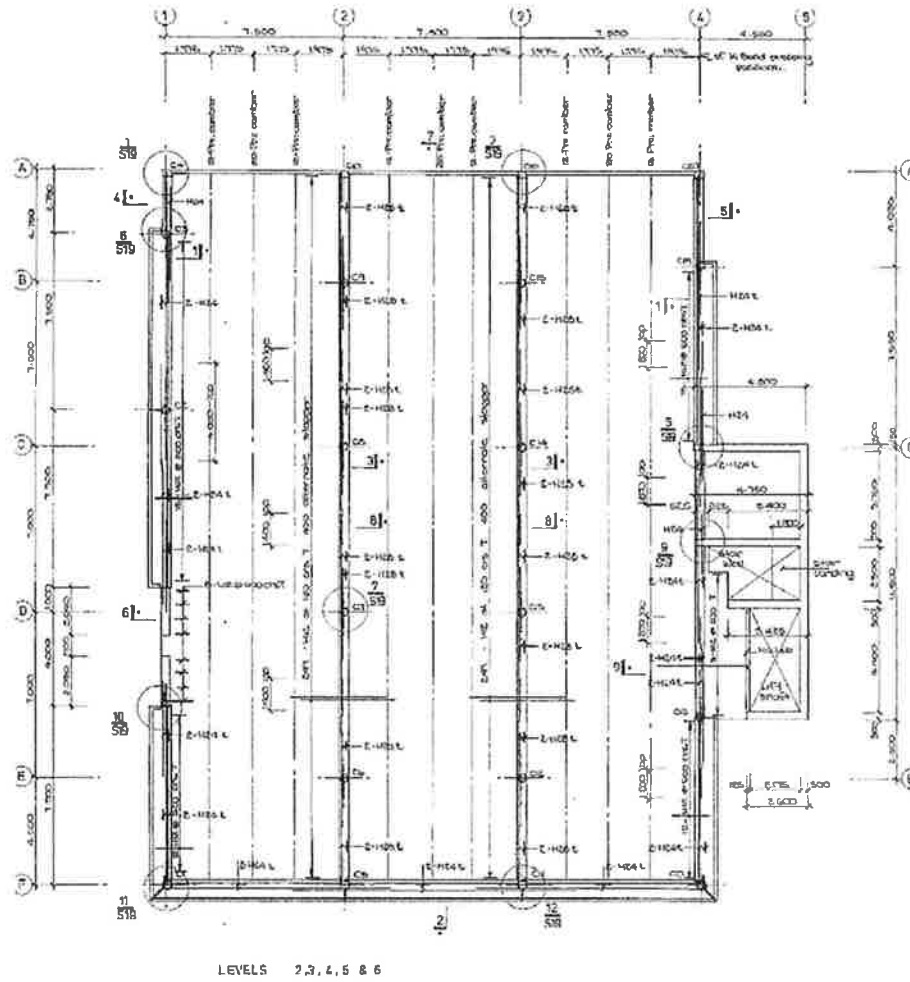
Level 2 to 6 Floor Layout (Extract from DENG Dwg S15)
